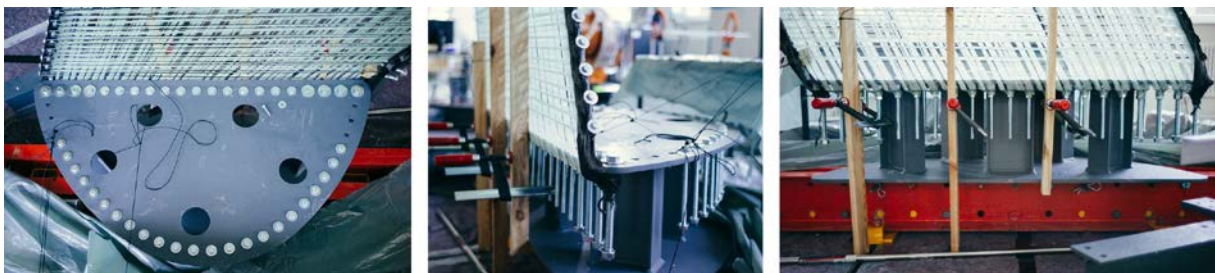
Shape defining, project specific foundation components anchored to the formwork system
